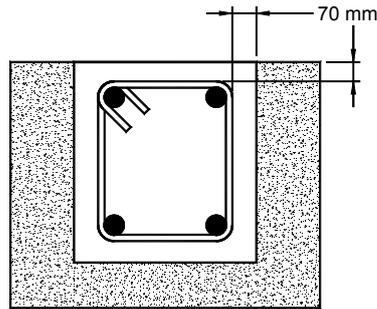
Minimum concrete cover of 70 mm for all types of reinforcement of elements cast and permanently exposed to earth or water.
